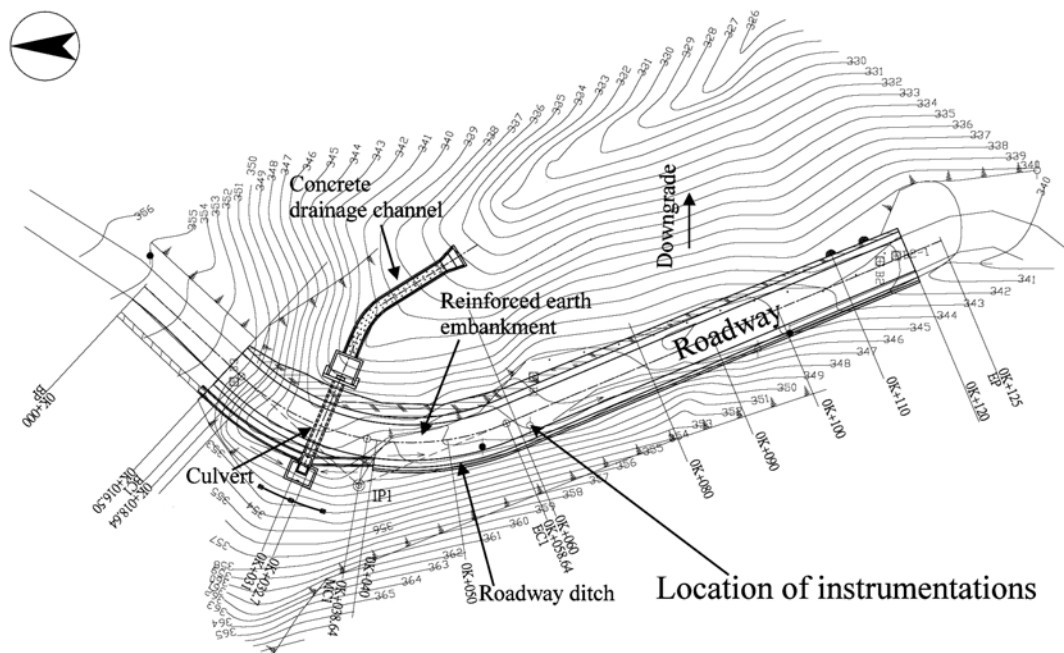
Layout of the mountain roadway rebuilt with the hybrid reinforced earth embankment
